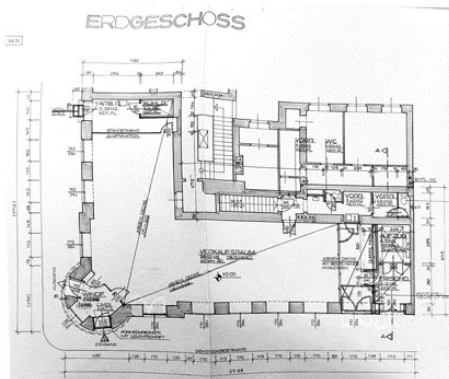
Building case 2 - Walfischgasse 10, 1010 Vienna-Austria
